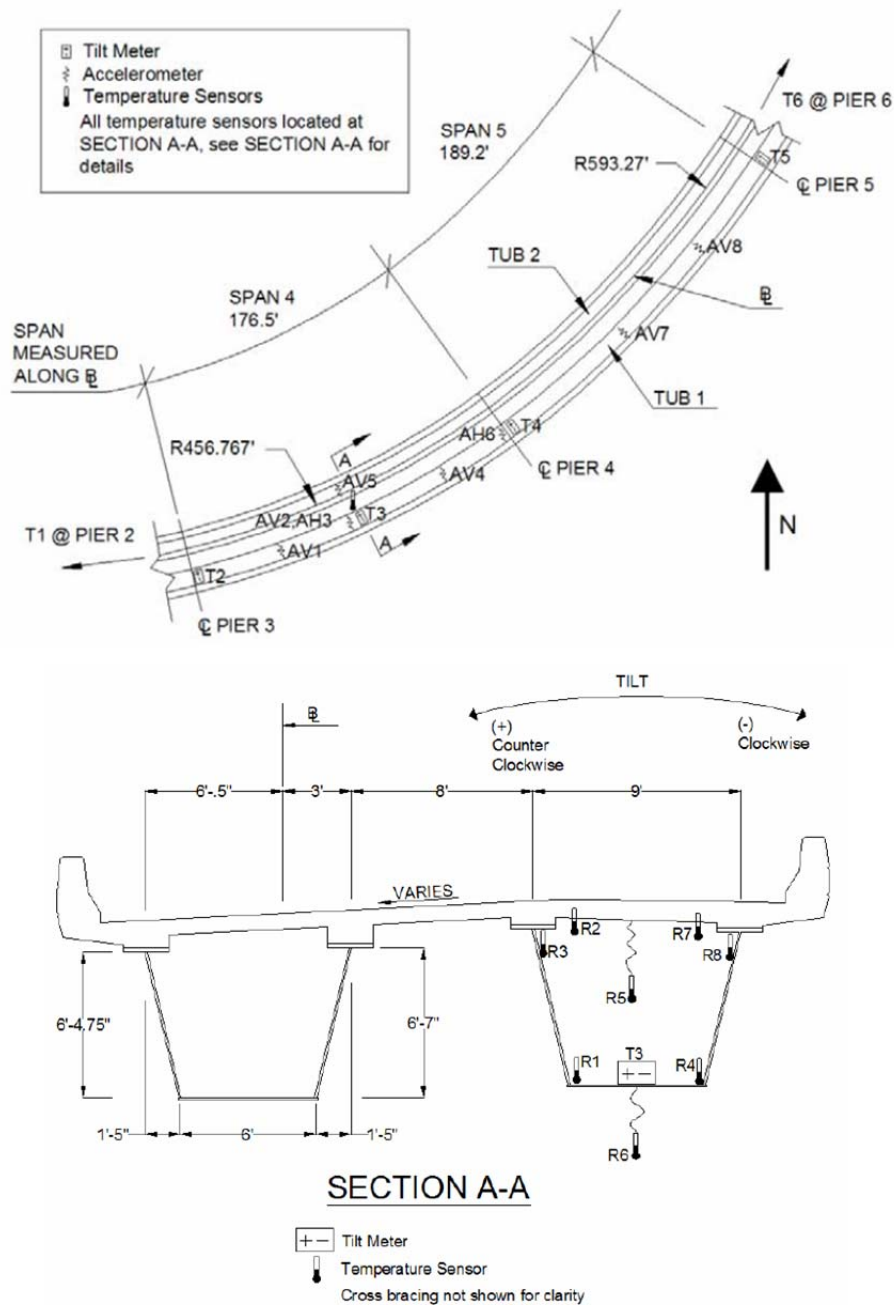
Instrumentation plan for steel box girder bridge in Connecticut (DeWolf et al. 2006)
